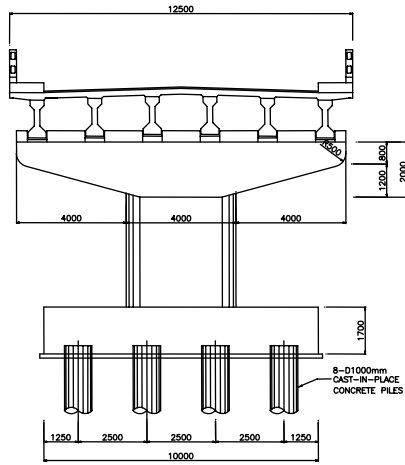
illustrates some of the typical substructure types applied for the proposed bridges.
